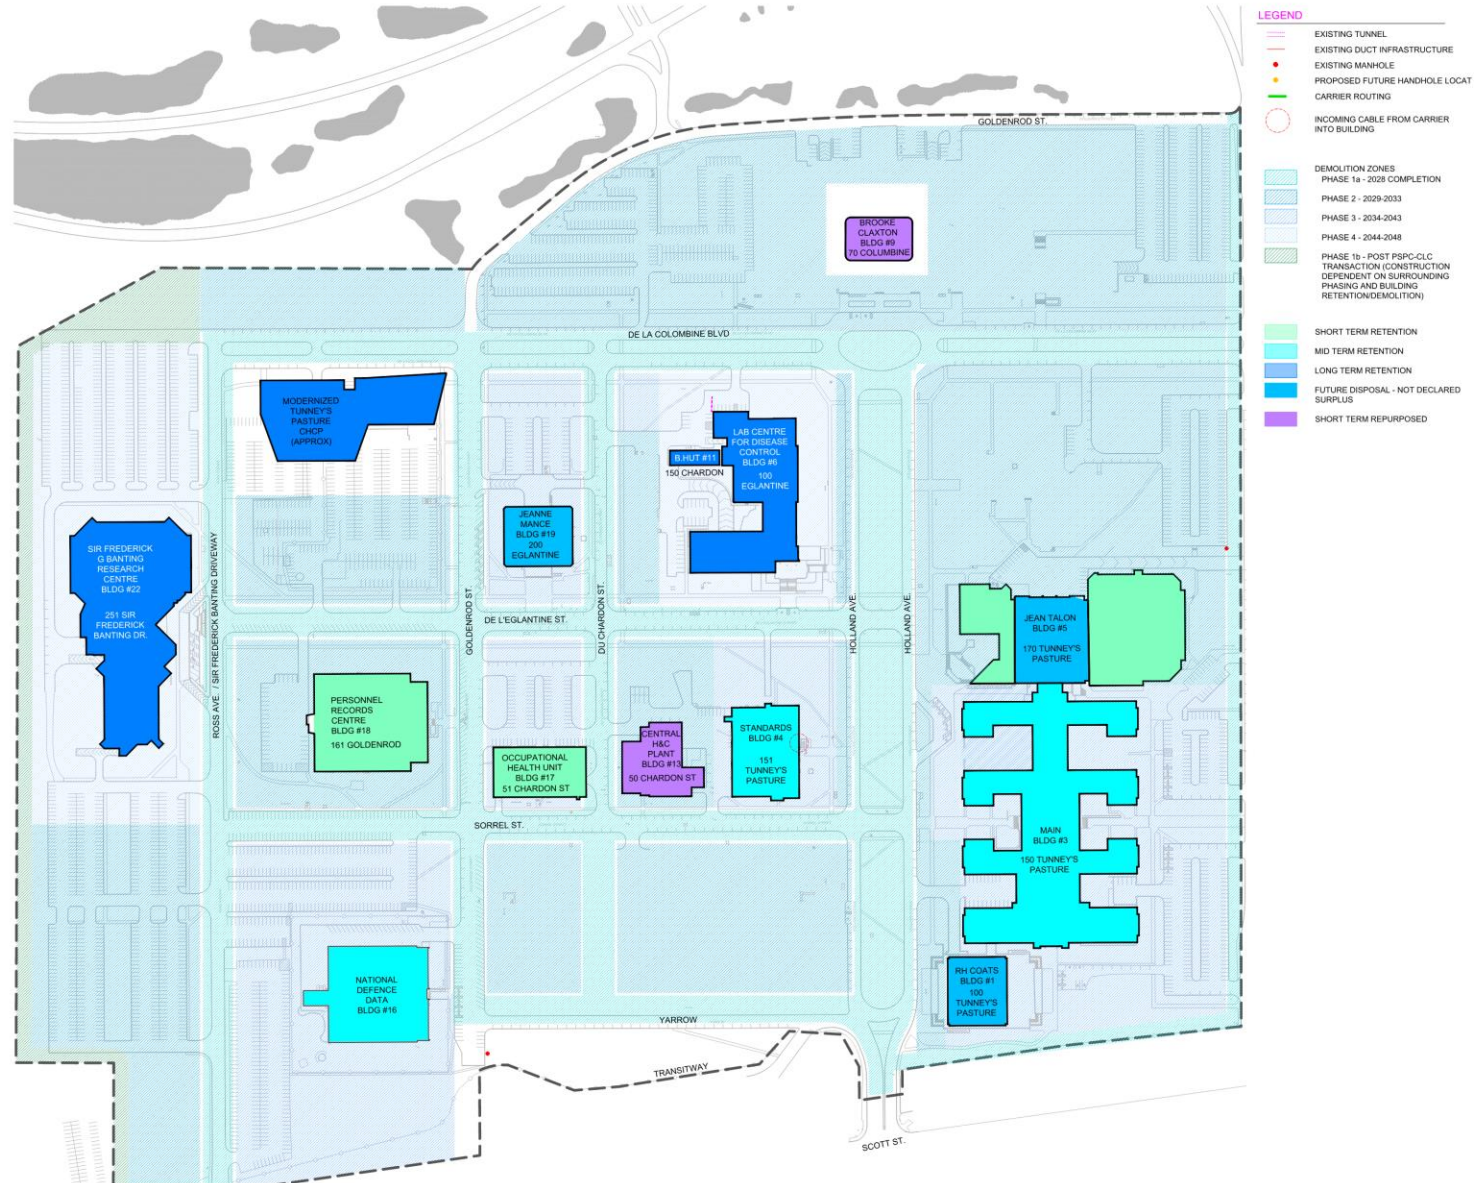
Proposed Phasing Plan For Tunney's Pasture Campus (All Phases, Drawing 2)
